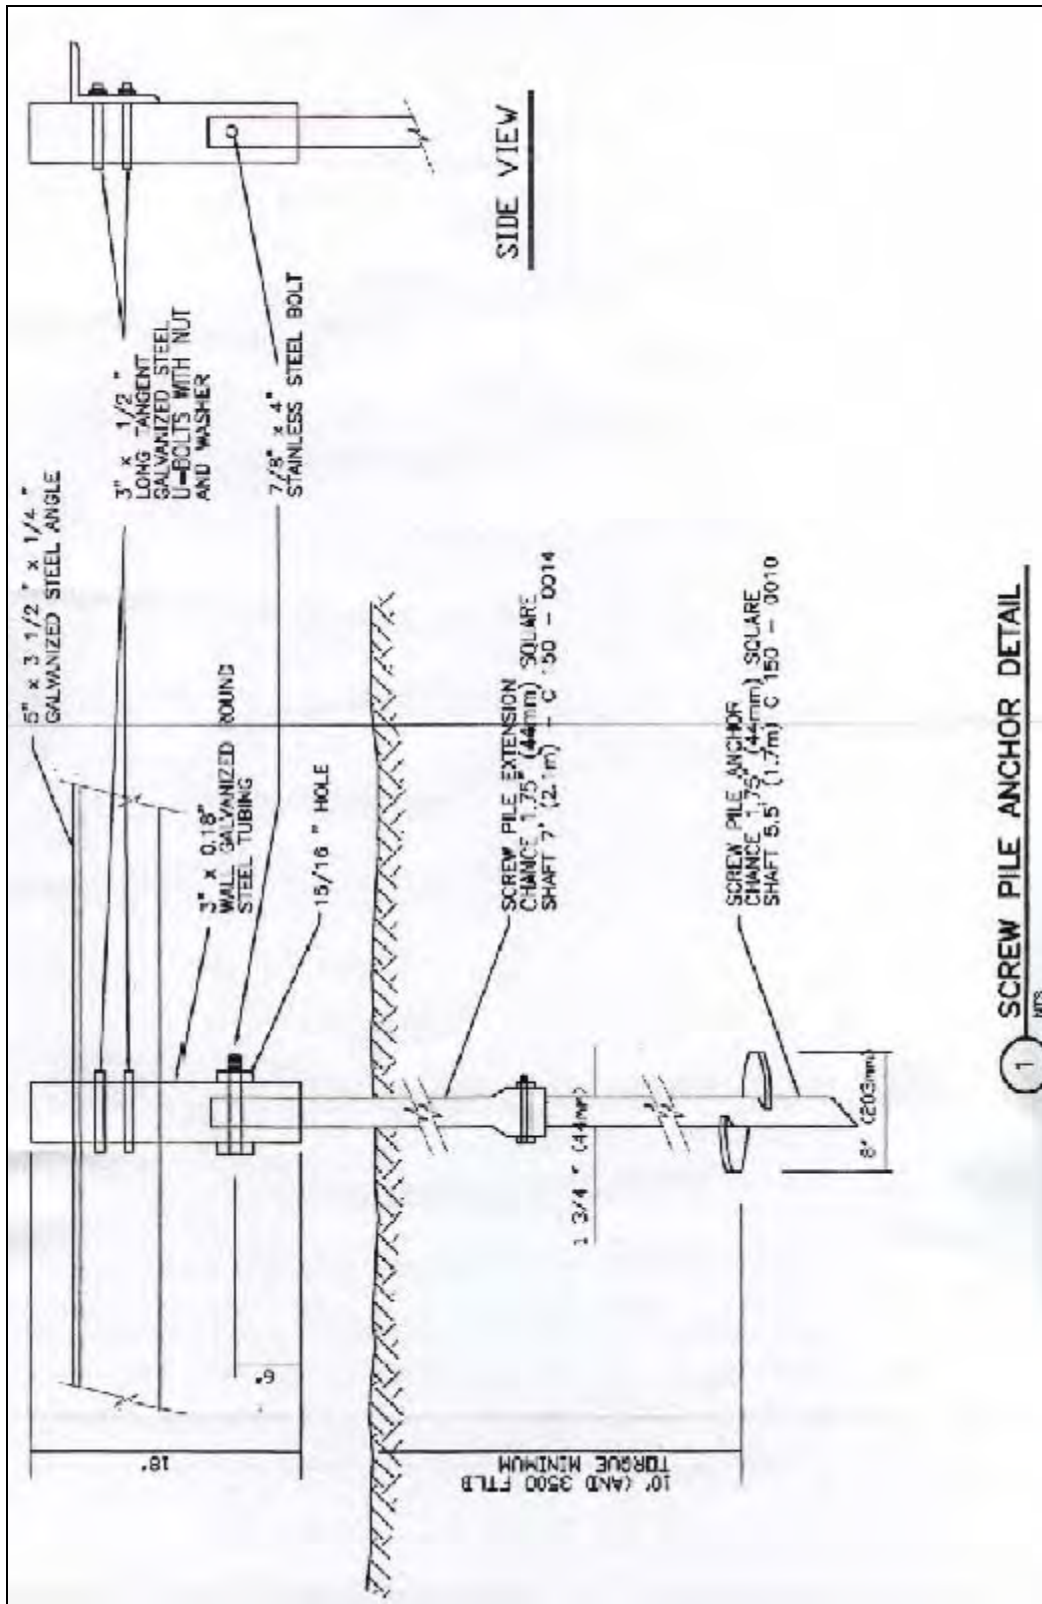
Typical Pier Detail (ANTHC, DEHE)
